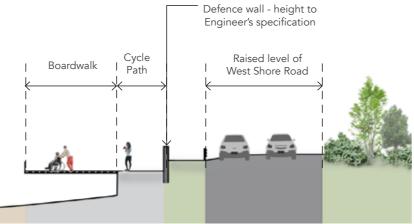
Section B-B through cantilevered walkway, diagram by LUC Indicative proposal subject to consultation with HRA and SEA.
